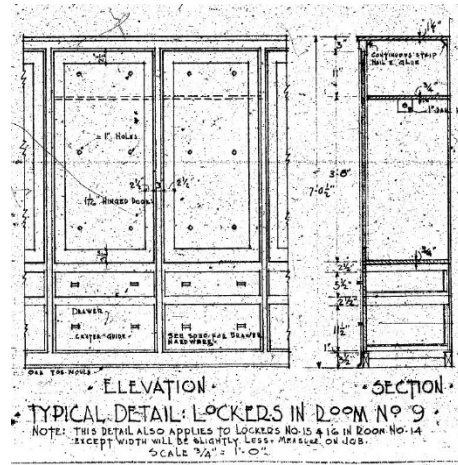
Drawing of built-in lockers in locker room (W. Horace Austin, Sheet 3)
